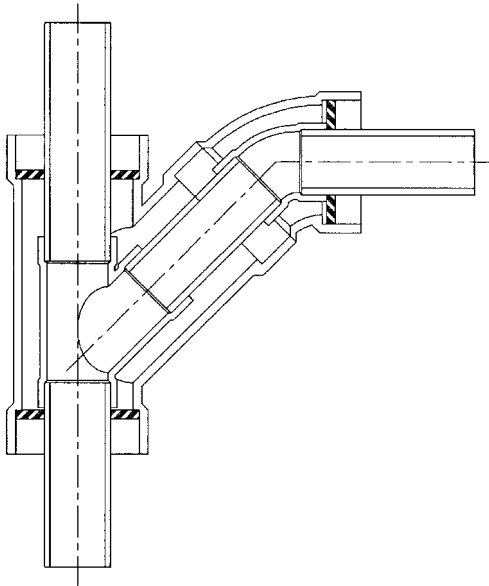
Example of thermoplastic long-turn wye using molded code approved carrier fitting. (*Orion Fittings, Inc.*)
